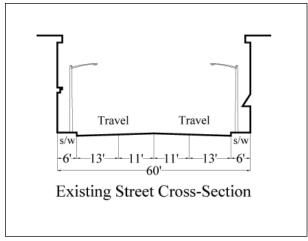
B Existing street cross section. Source: Kimley-Horn and Associates Inc.
